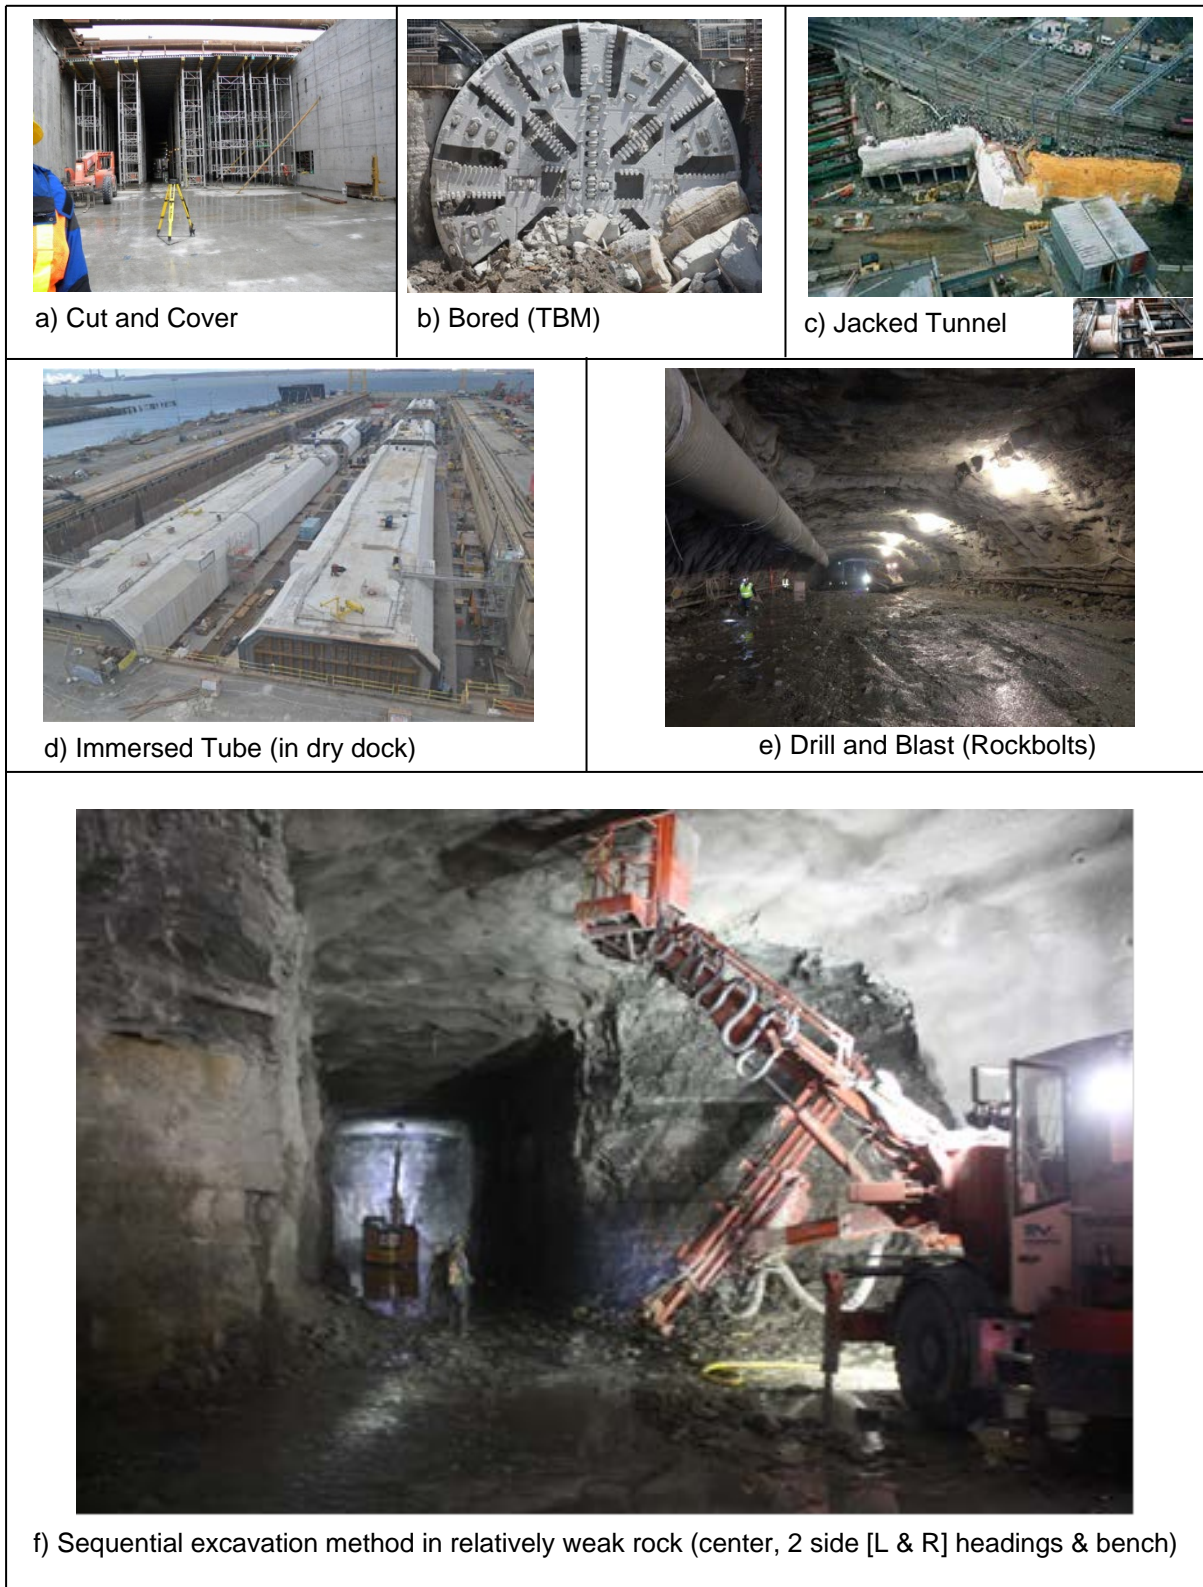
Typical construction methods and general shapes for highway tunnels.
